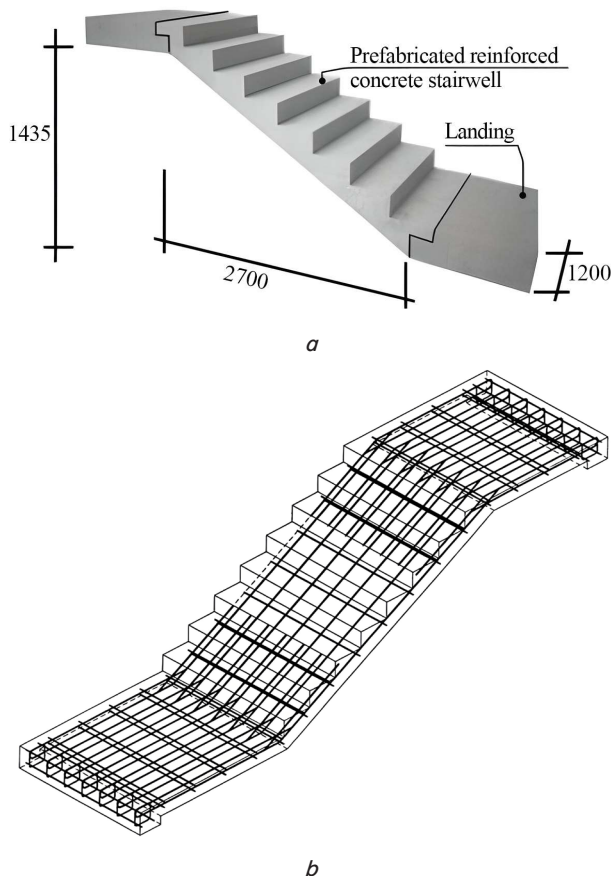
The investigated reinforced concrete stairwell flight: *a* – structural scheme of the prefabricated reinforced concrete stairwell flight; *b* – scheme of its reinforcement
